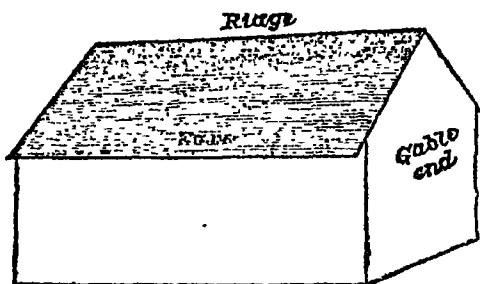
shows a house with a gable roof. The roof surface is shaded.
